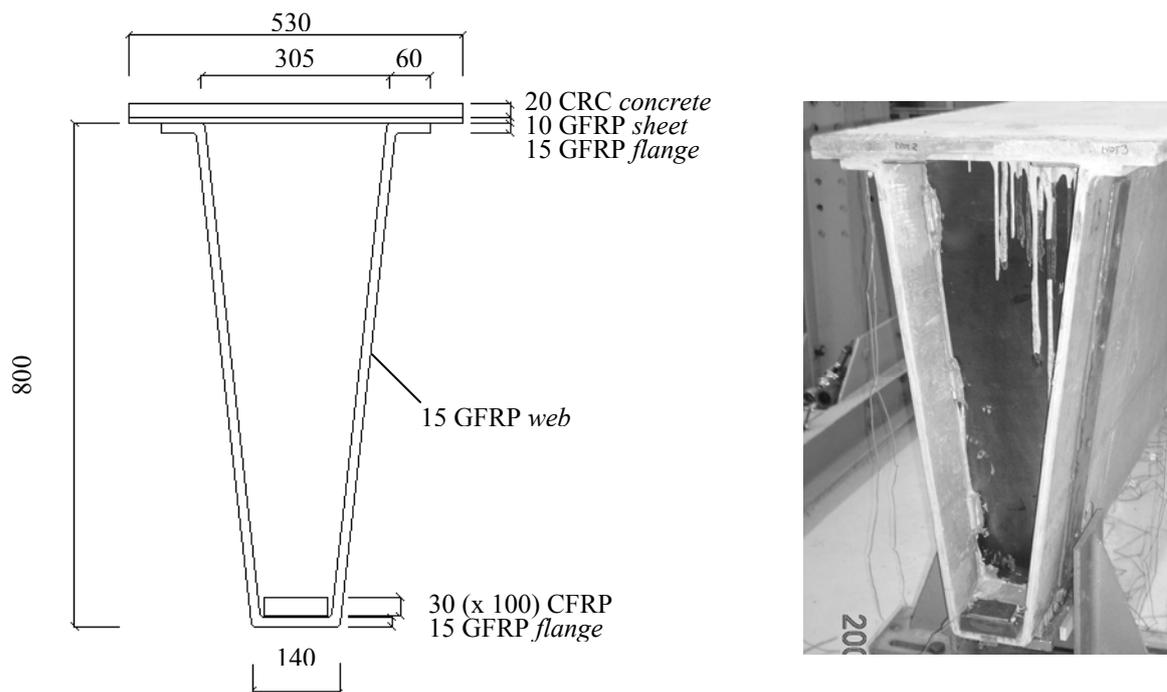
The cross-section of the prototype beam (to the left) and a picture showing the beam after casting of the concrete in the deck (to the right). Dimensions in mm.
